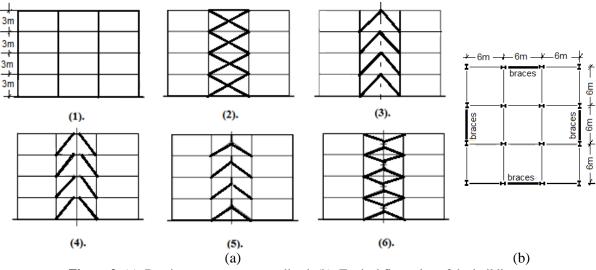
(a). Bracing arrangements analized; (b). Typical floor plan of the buildings.
